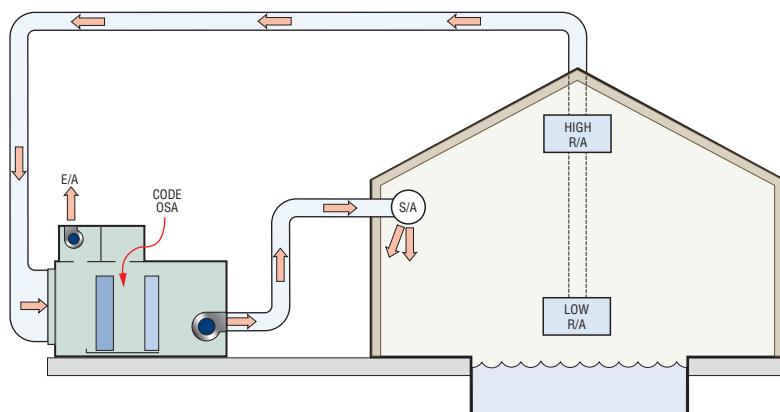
Extended Outdoor Air System Conceptual Airflow Diagram
